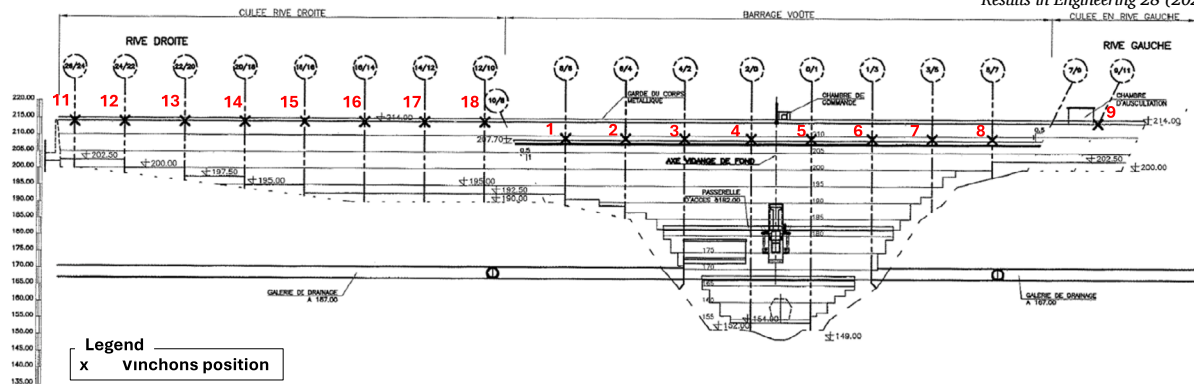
Layout of vinchons, longitudinal view of the dam from downstream.
